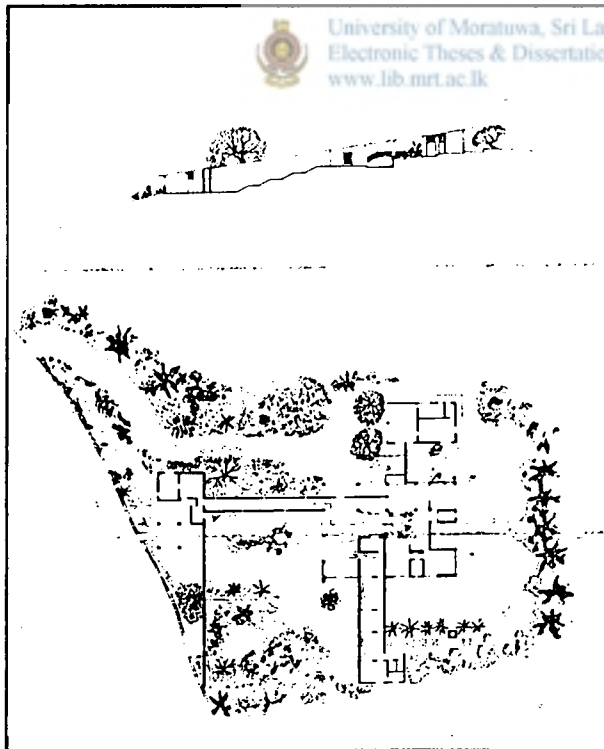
; Plan and section of A.S.H. De Silve house, 1960
